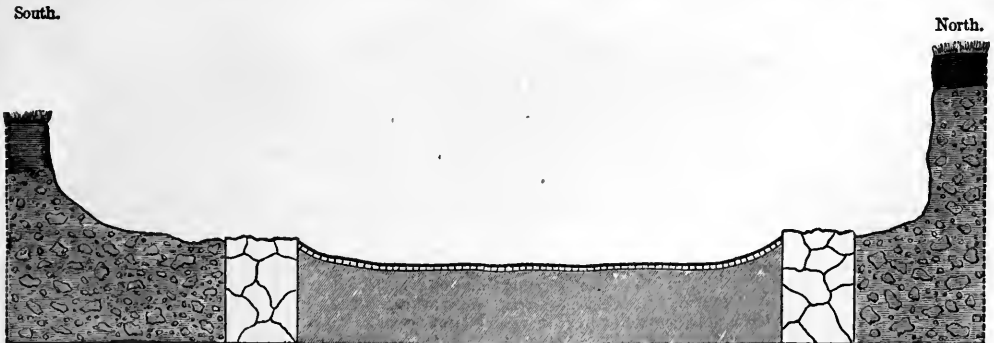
A NORTH AND SOUTH SECTION THROUGH THE SUBSIDED FLOOR OF A CORRIDOR PAVED WITH TESSERA (Silchester). Outside the broken-down bounding walls, the excavated ground on each side is shown for a short space. Nature of the ground beneath the tesserae unknown. Scale, $\frac{1}{32}$.
